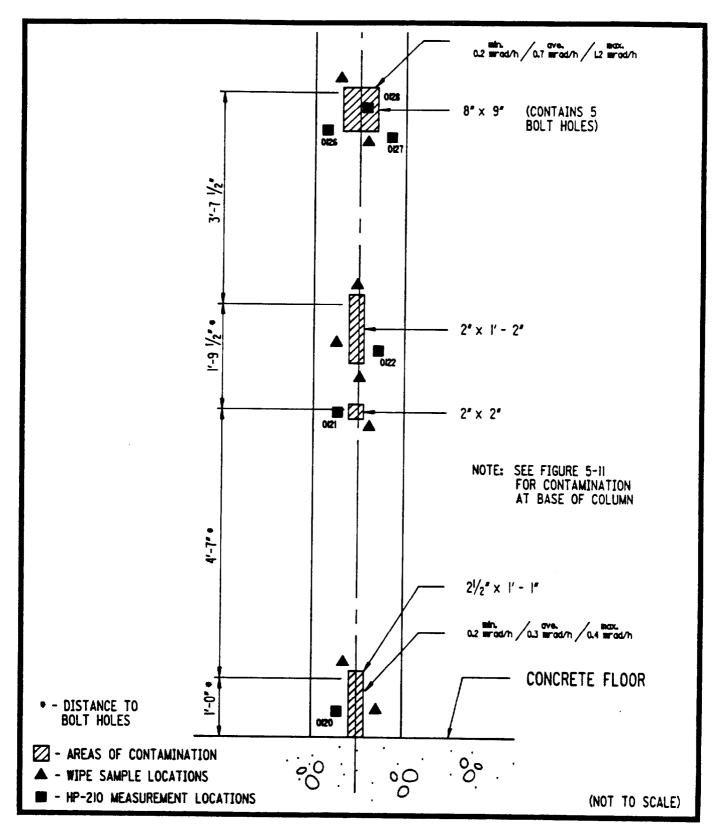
AREAS OF CONTAMINATION - COLUMN 2, SOUTH FACE (ROOM 1, FIRST FLOOR)
